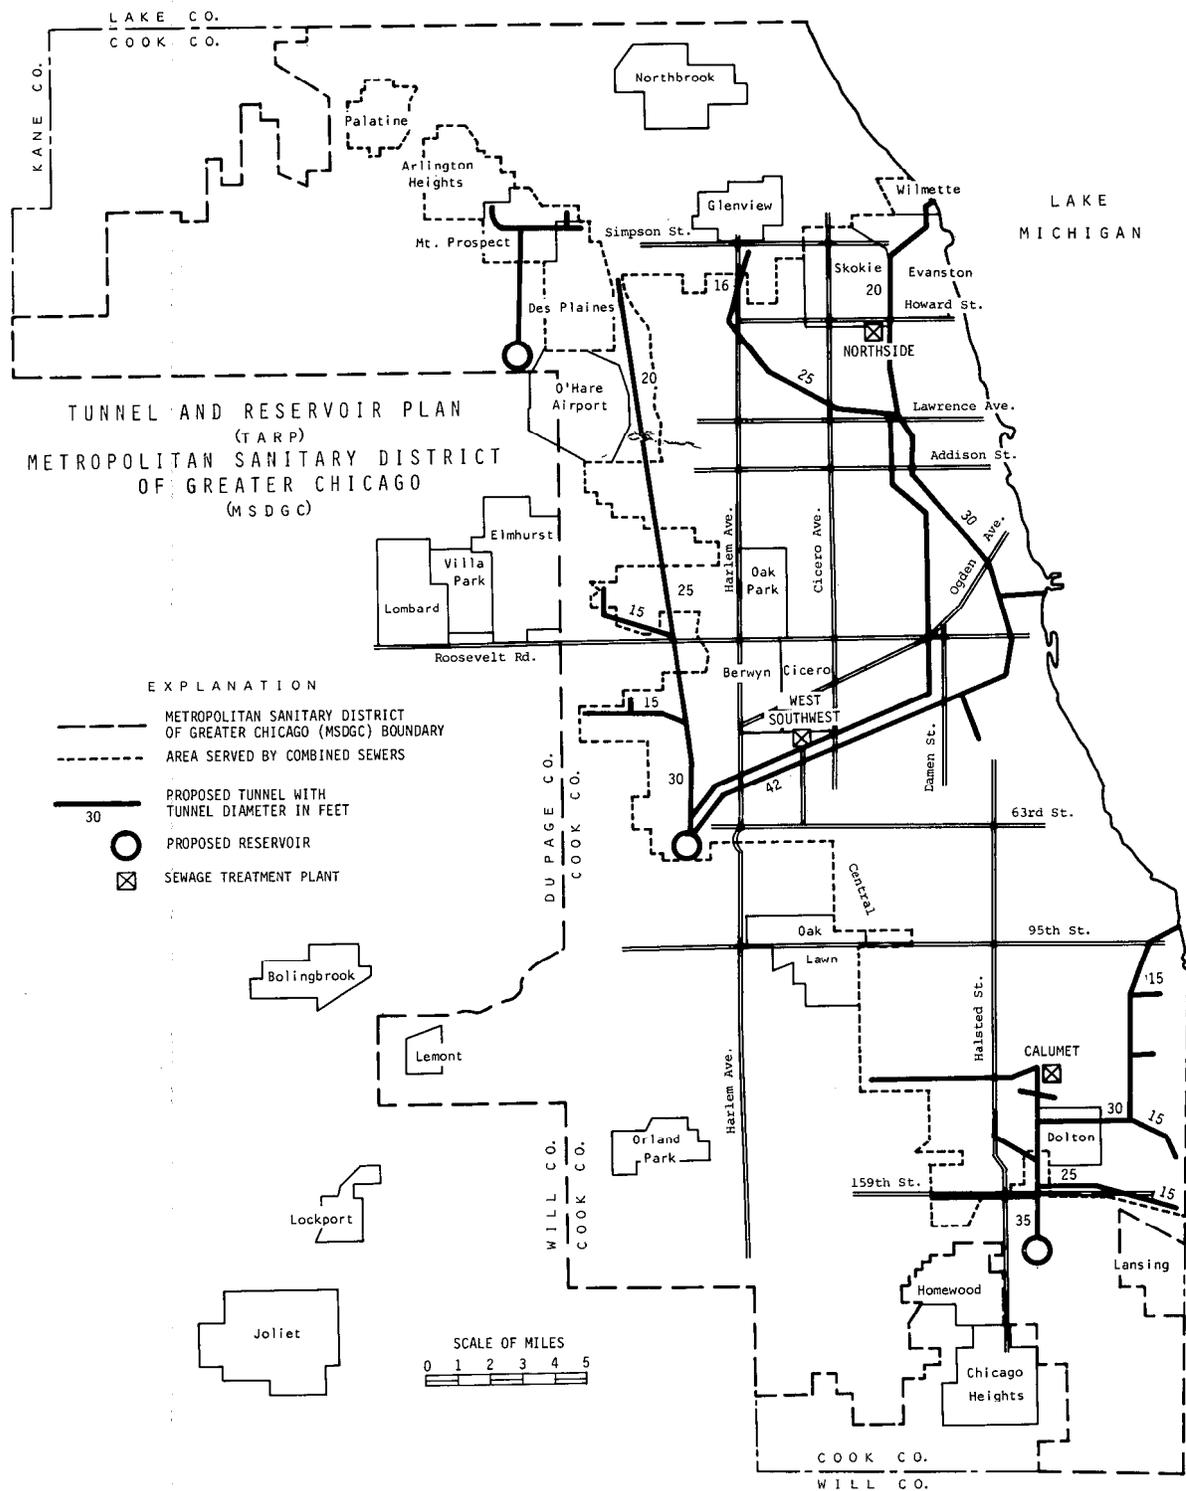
Layout of Chicago Tunnel and Reservoir Plan (TARP)
